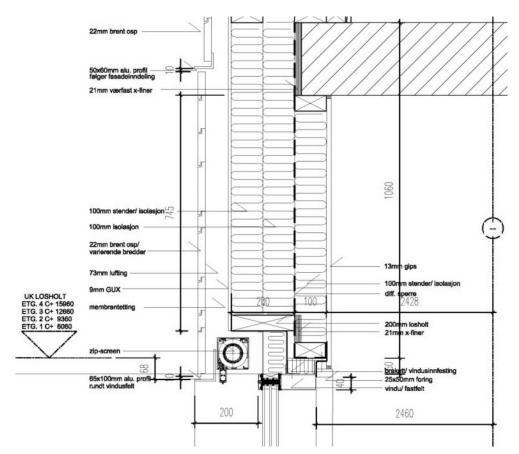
Vertical details above the window. Illustration: Snøhetta.
